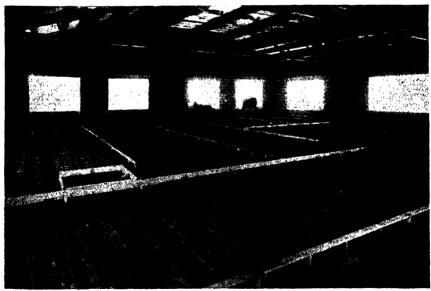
Second-story floor installation. (Bethlehem Steel Company.)
